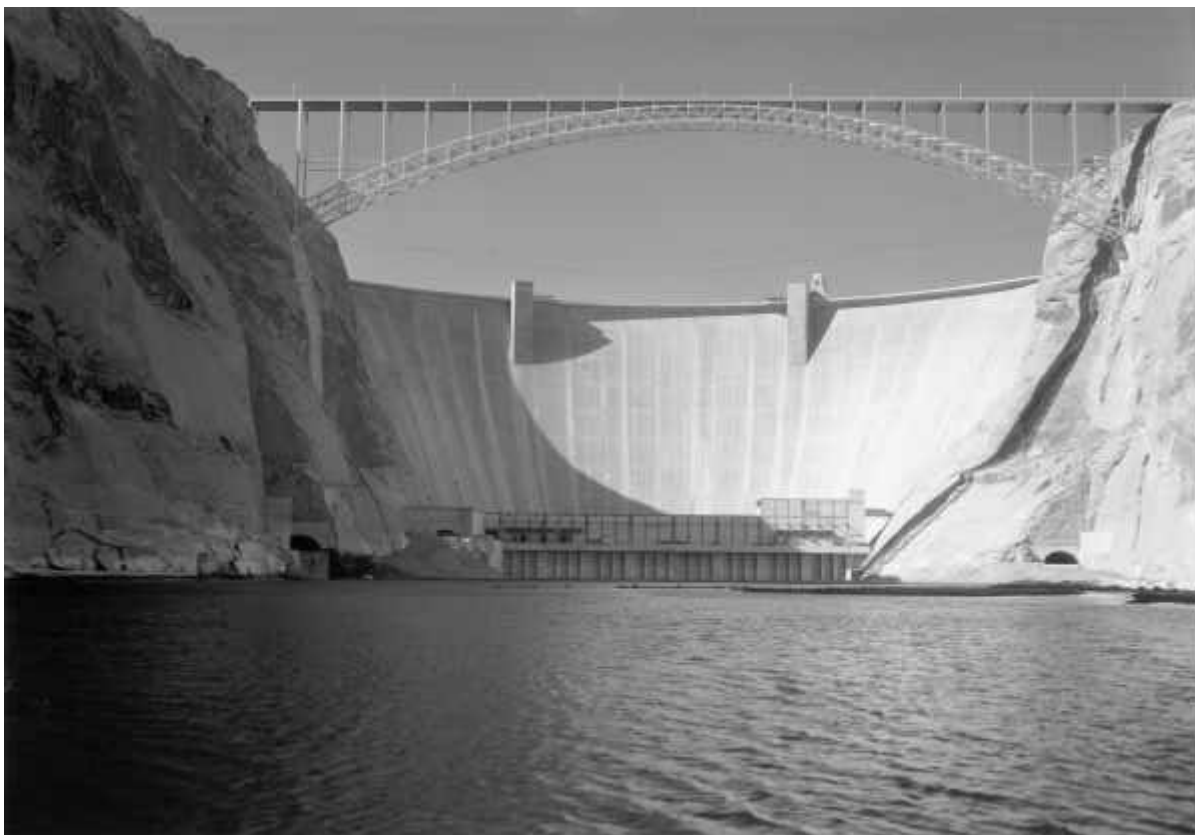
Glen Canyon Dam. View towards downstream face showing powerhouses.
